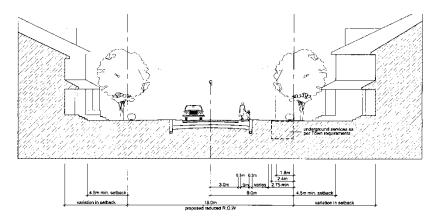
Proposed Rolled Curb Street Section. Note: This sketch is for illustrative purposes, and does not replace Town standards.
